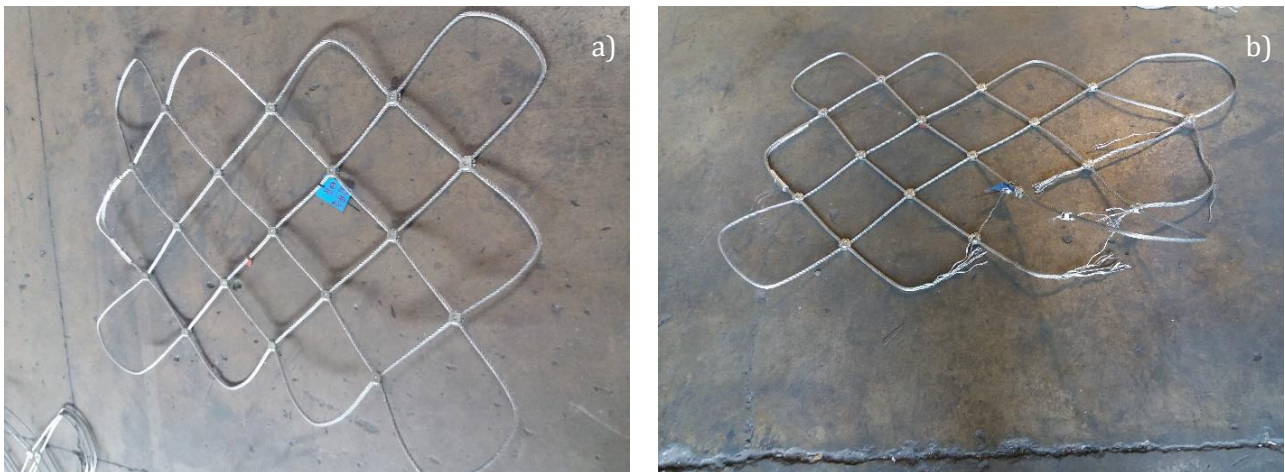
Tested HCP panel; a) Specimen before test and b) Specimen brake due to loading process
